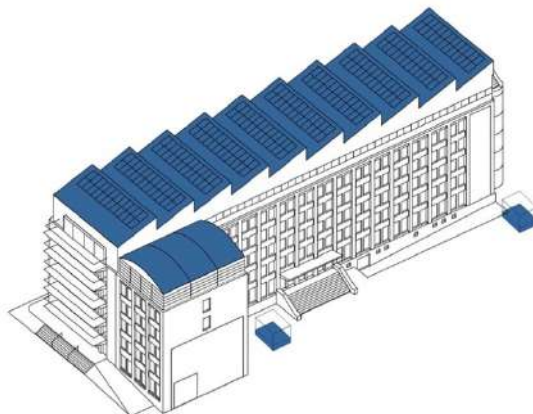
Greenhouse on the roof terrace. Authors: PLURAL
